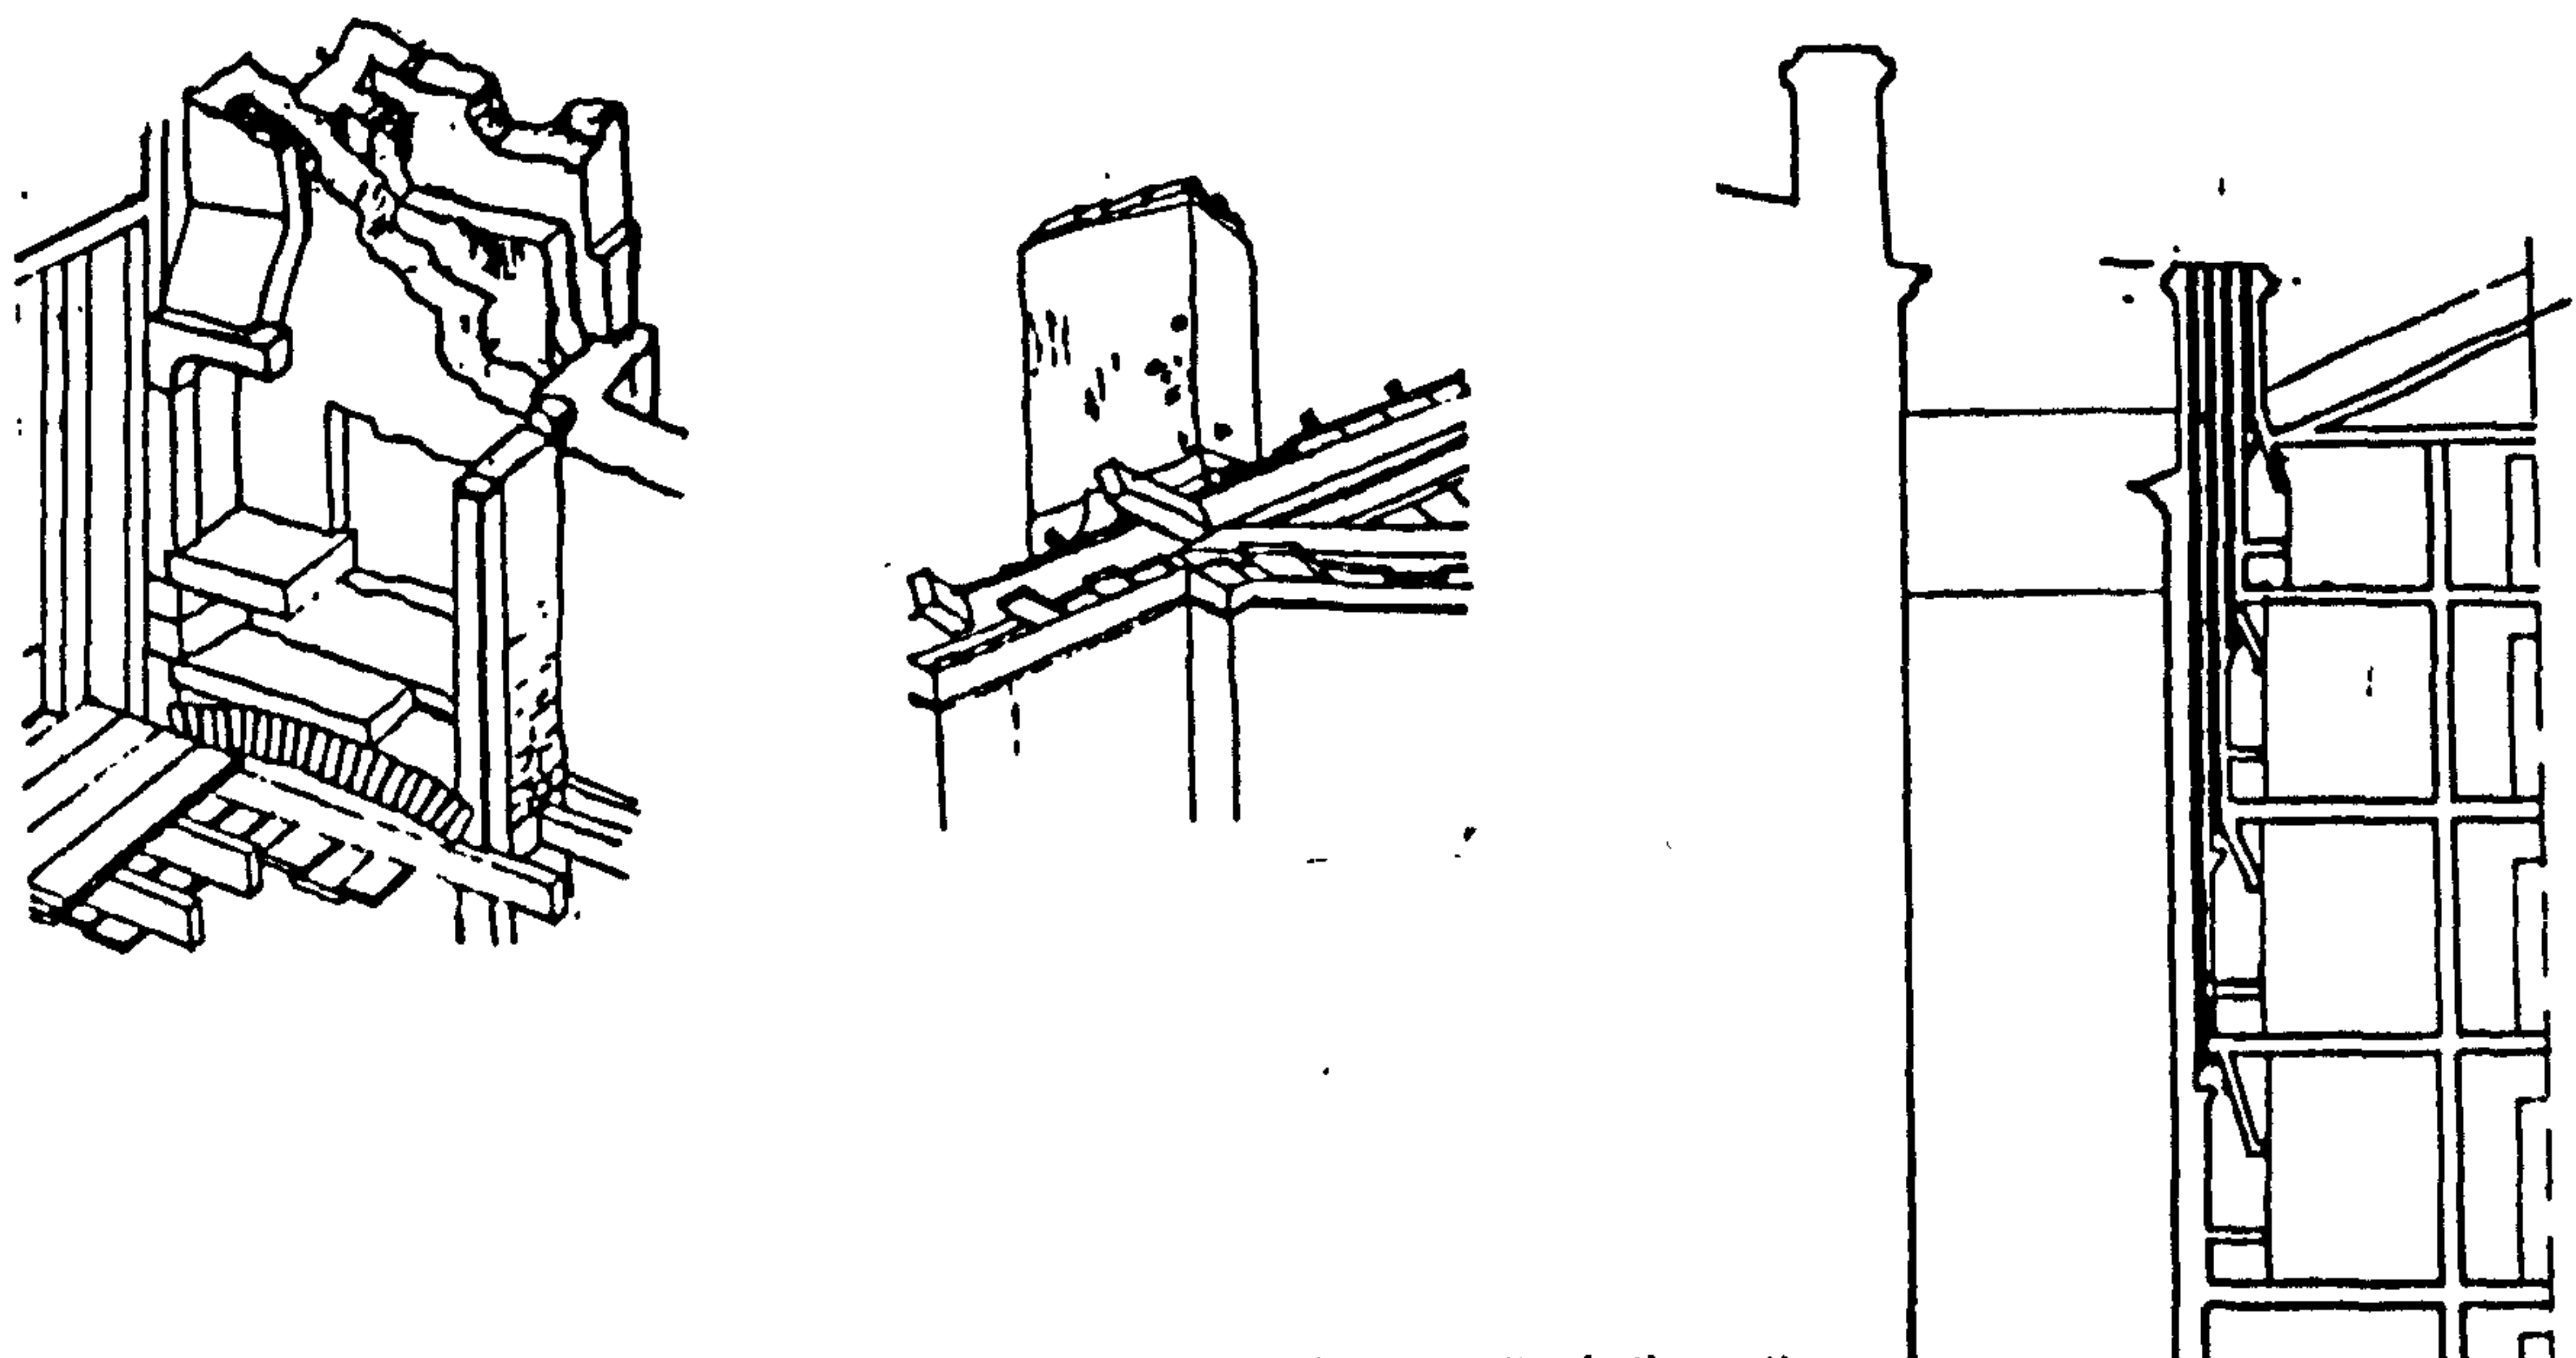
and 3.126-Detail construction of a chimney (building J)
